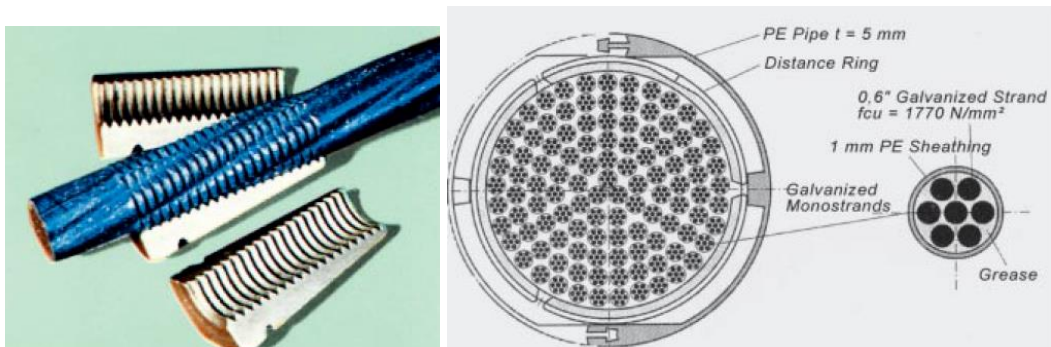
Strand Wedge and Typical Layout Section of Strands in A Cable (Svensson, 2012)
